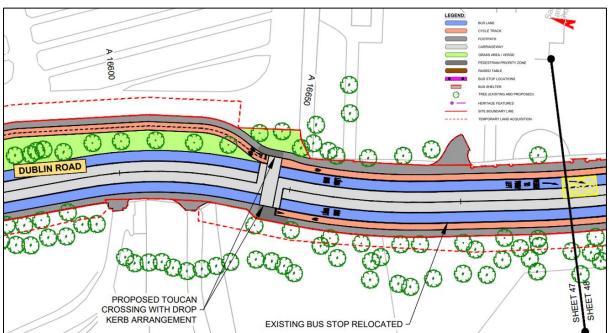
Extract from General Arrangement Drawing at Beauchamp House (Sheet 47)
